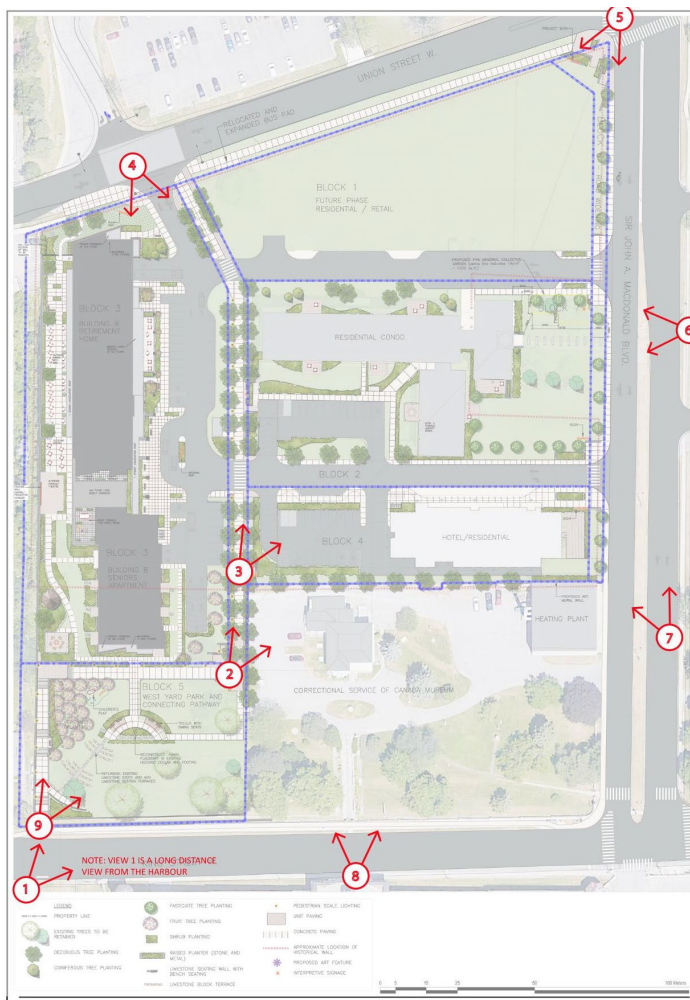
A key plan locating significant views throughout Union Park. Source CWS Landscape Architects Inc.
